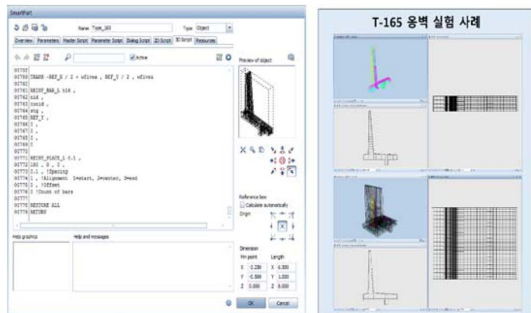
Example of BIM library for retaining wall (T-165) in Allplan
